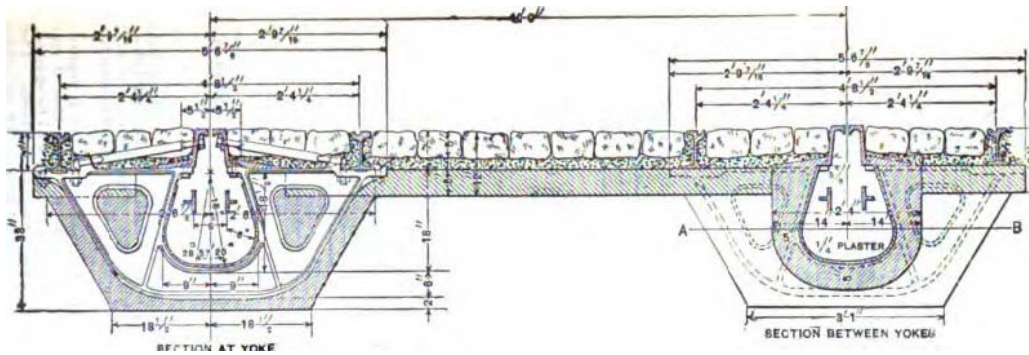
Cross-section of Conduit Rail in Washington, 1895
